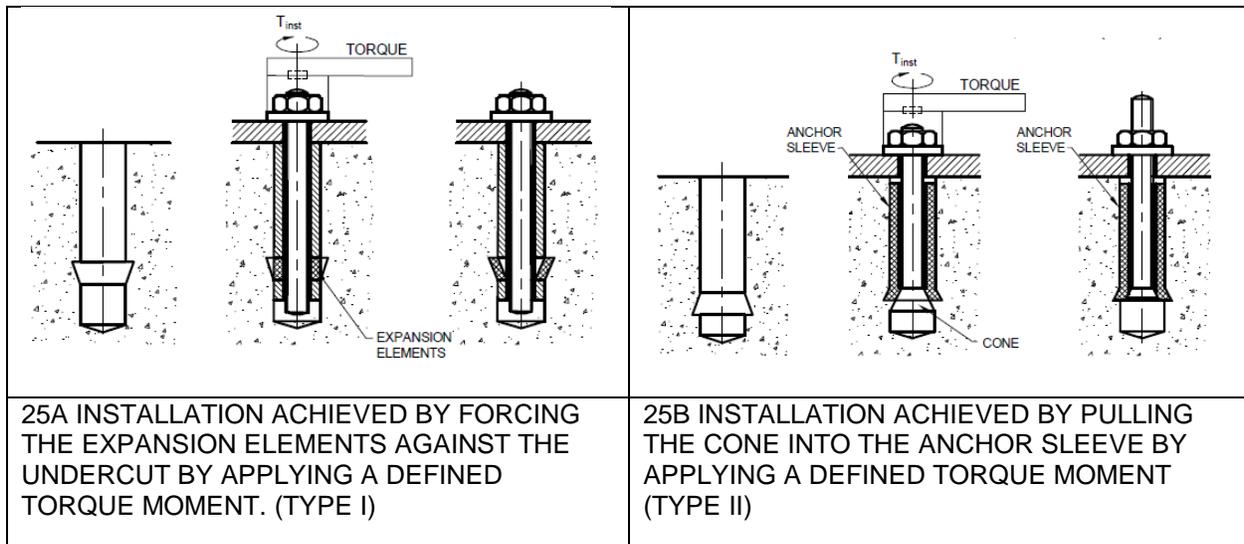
TORQUE CONTROLLED INSTALLATION – UNDERCUT (MECHANICAL) ANCHORS
